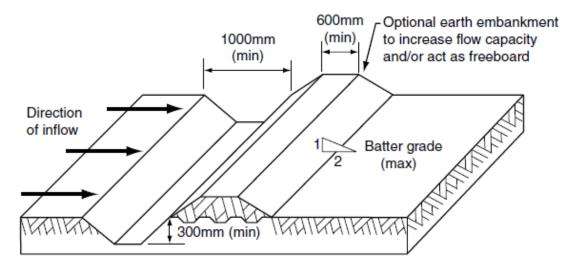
Typical drainage configuration - channel (IECA, 2008)
